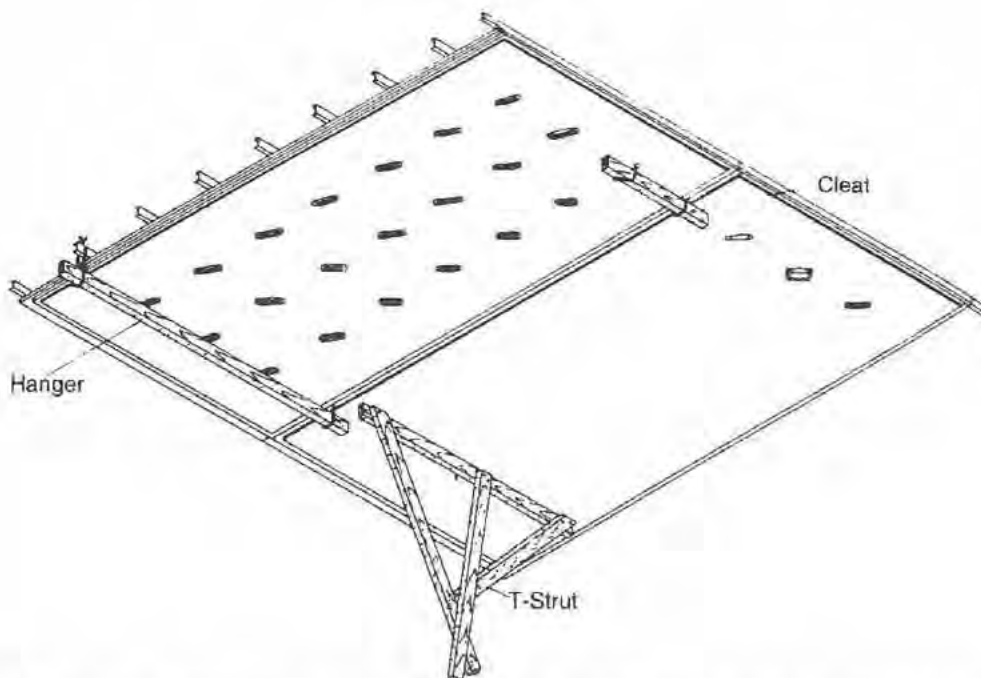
Plainface (fibrous): hanging plainface for wiring and wadding to metal fixings.
